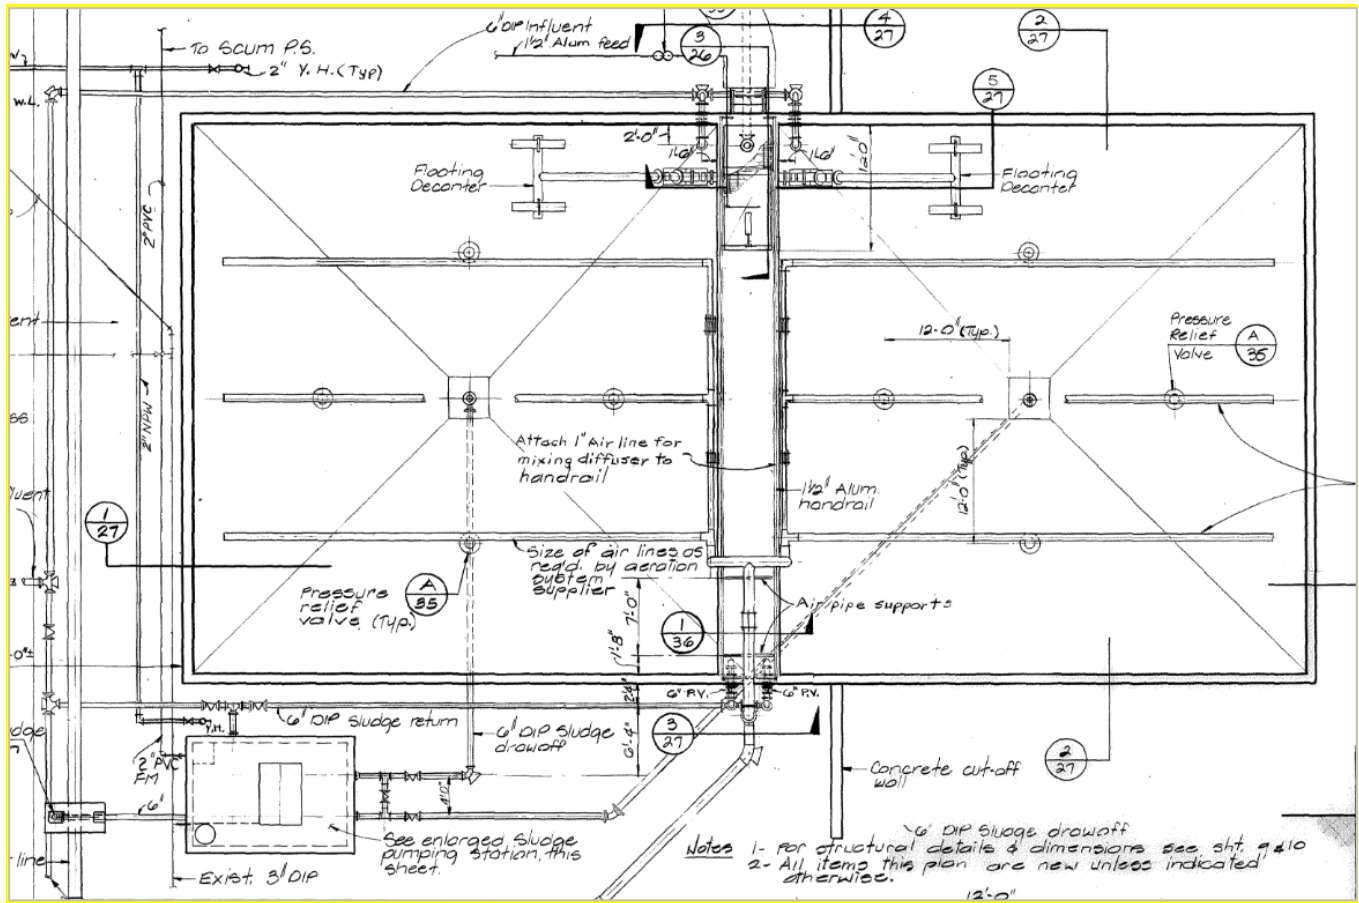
Plan View of Existing Mixing System in On-site Tanks
